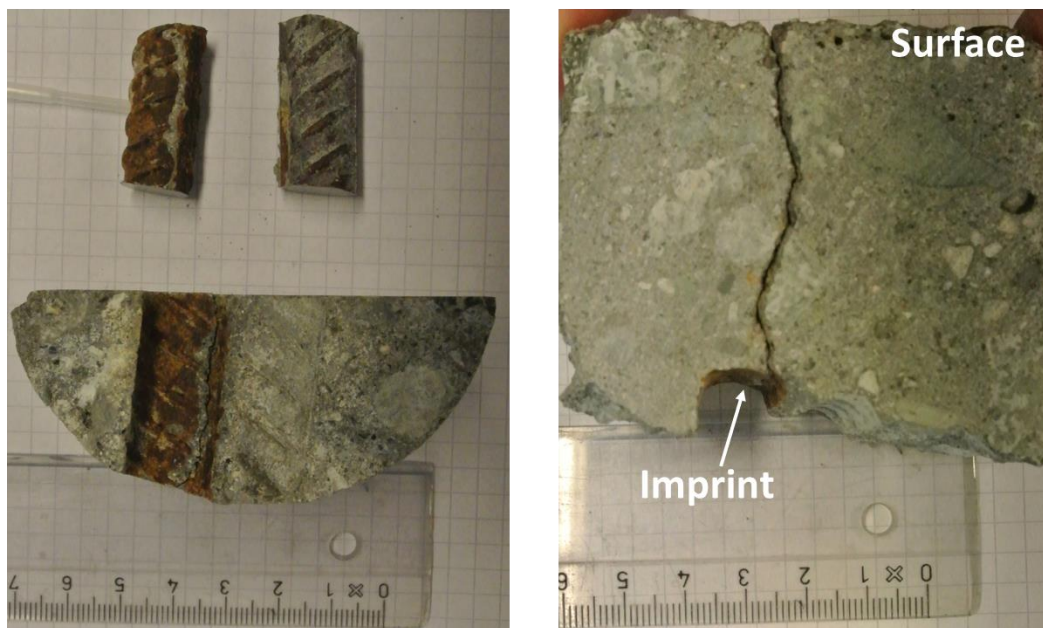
Extraction of reinforcement from the Core E from Moholt Bridge. Stirrups located left and right to the crack and imprint of corrosion products in the steel-concrete-interface facing upwards (left). Cut surface showing the crack and imprint of corrosion products in the steel-concrete-interface of the left stirrup facing upwards (right). Picture: Andreas Rygg
